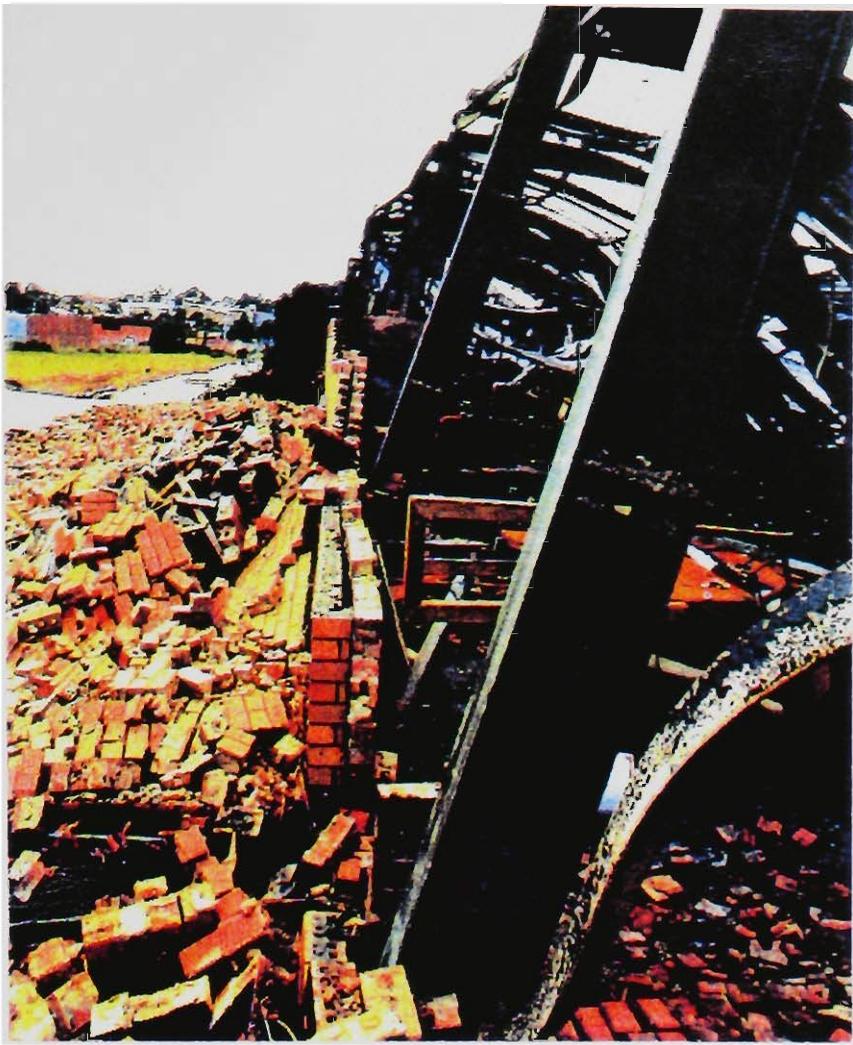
Case 4 - Toy Factory and Warehouse (Melbourne, 1989)
